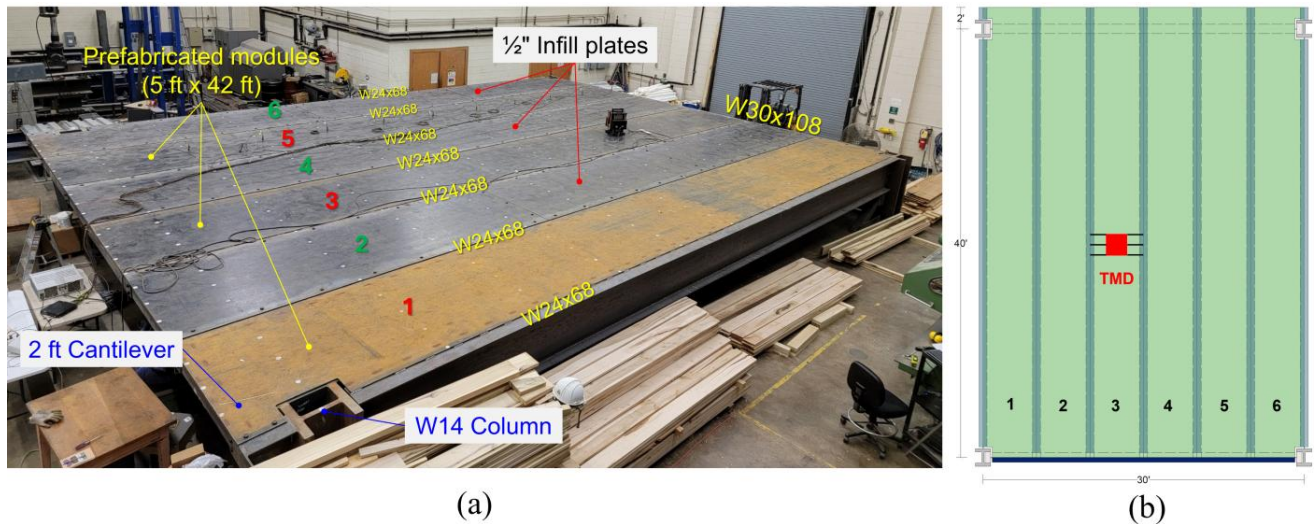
30 ft × 40 ft All-Steel FastFloor specimen. (a) Laboratory specimen with components annotated. (b) Plan layout of the FastFloor specimen with module numbers and the TMD location shown
